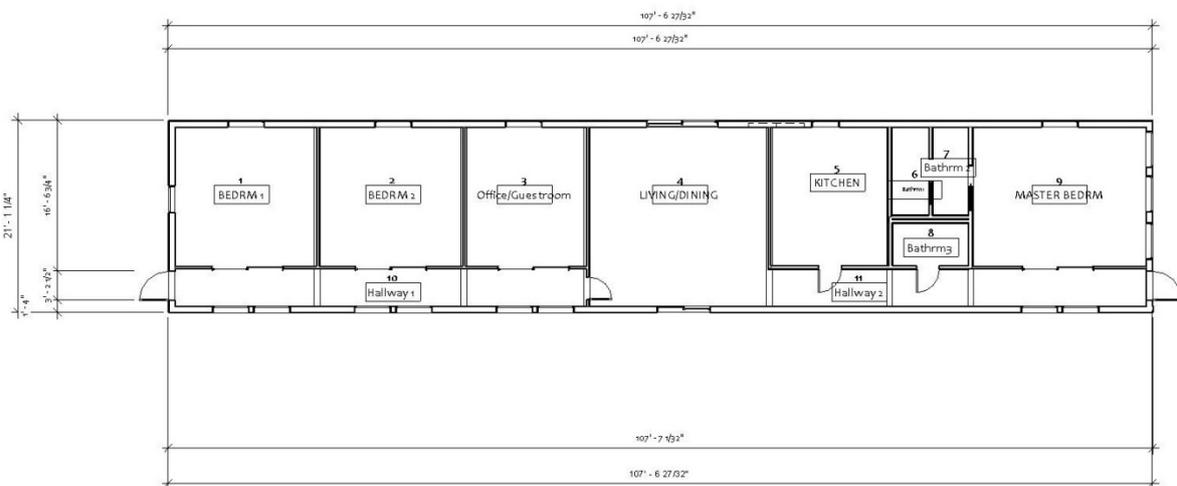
Revit floor plan of Seahouse
